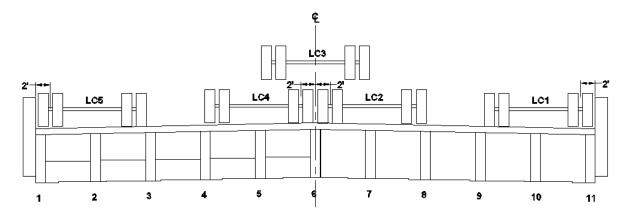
Load cases for composite timber bridge live load testing (looking north)
